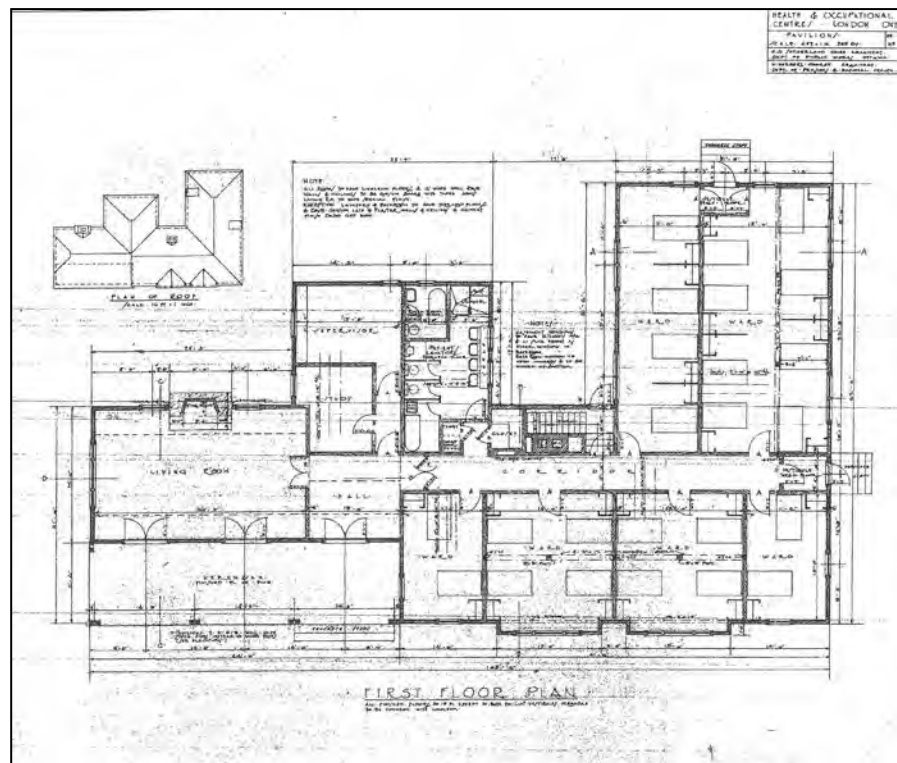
Plan of cottage pavilions. Source: Historica Research, 2000.
